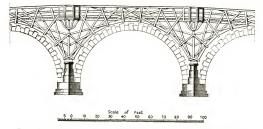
The stone piers of Westminster bridge and the wooden superstructure originally proposed. The masonry arches actually built are shown by dotted lines,
